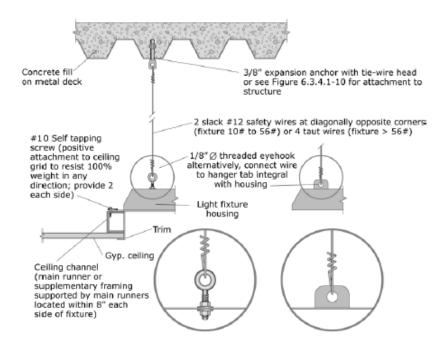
Recessed Light Fixture in suspended Ceiling (Fixture Weight 10 to 56 pounds). (FEMA E-74, 2012, Reducing the Risks of Nonstructural Earthquake Damage)
